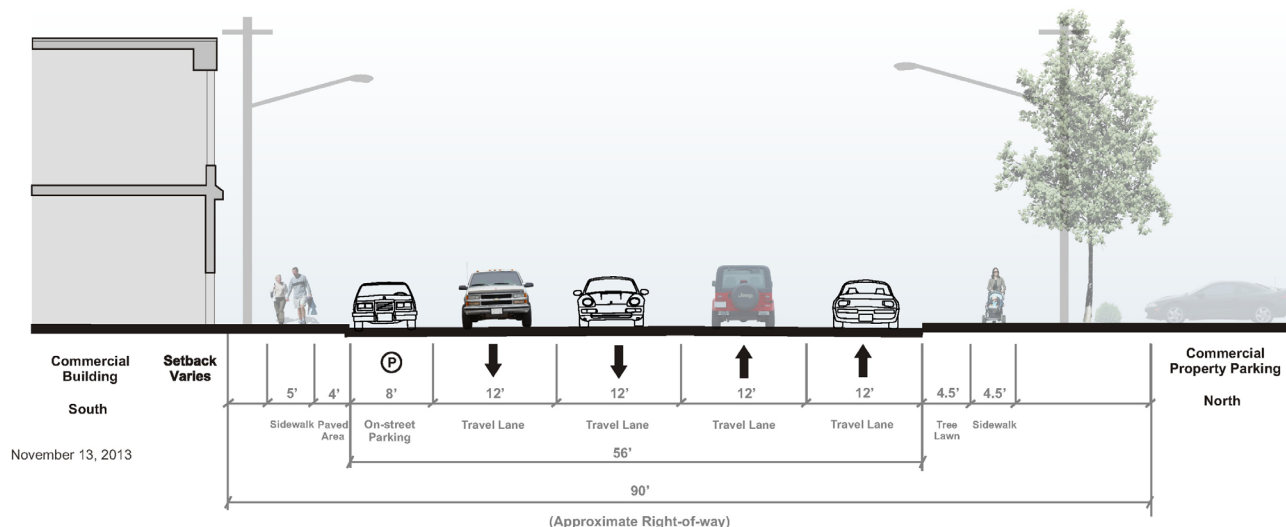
Roosevelt Road to N/S Washington Street cross-section
